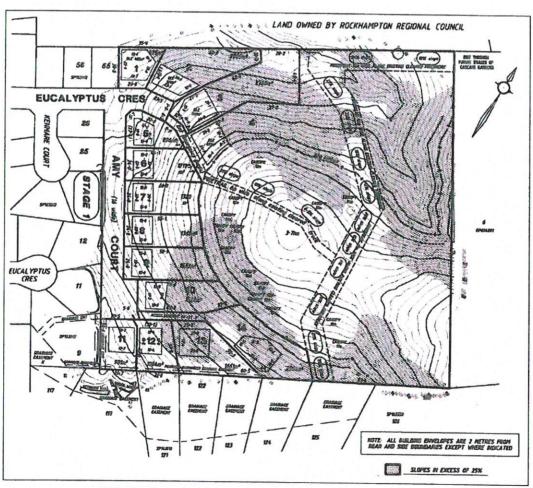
PROVIDED PROPOSED LOT LAYOUT
